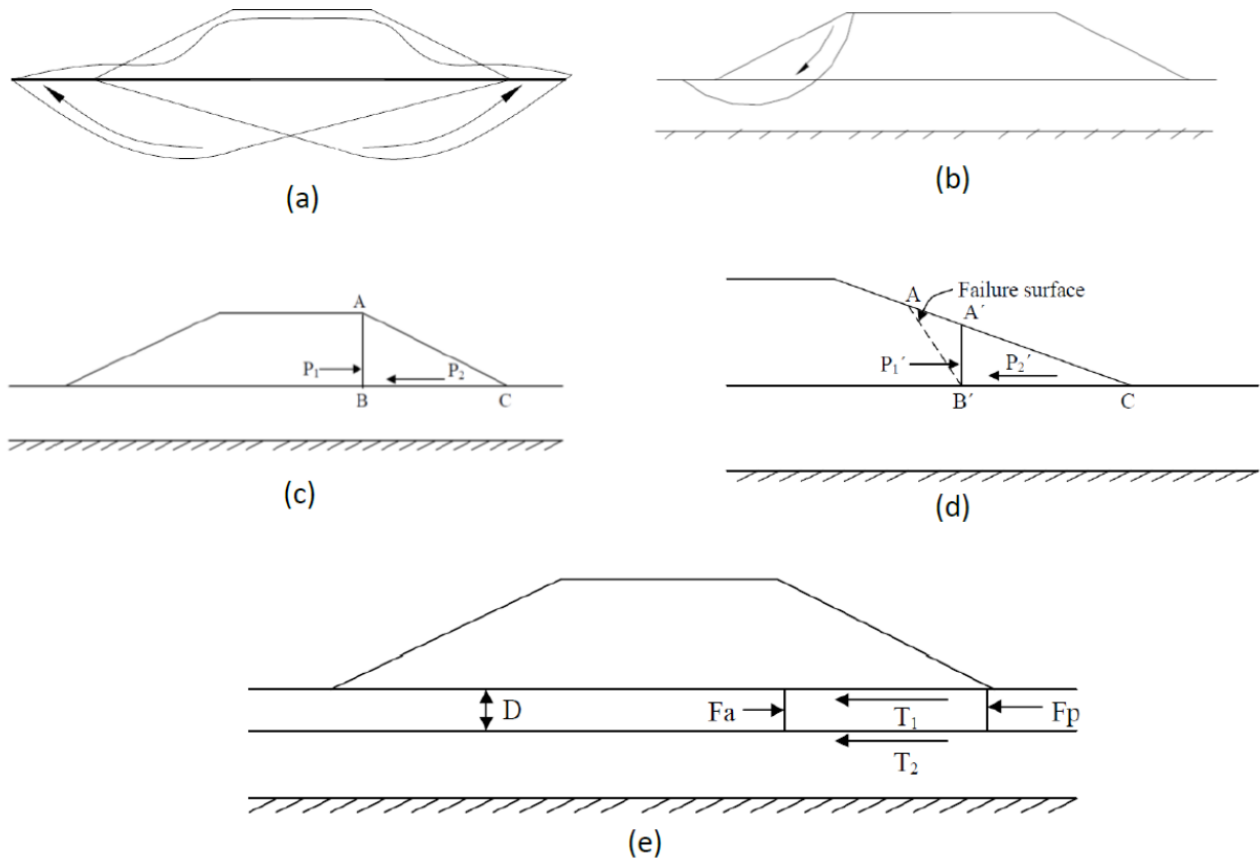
Modes of embankment failure: (a) Bearing capacity failure; (b) rotational failure; (c) sliding failure; (d) spreading failure; (e) foundation soil squeezing failure (Zaman, 2019)
